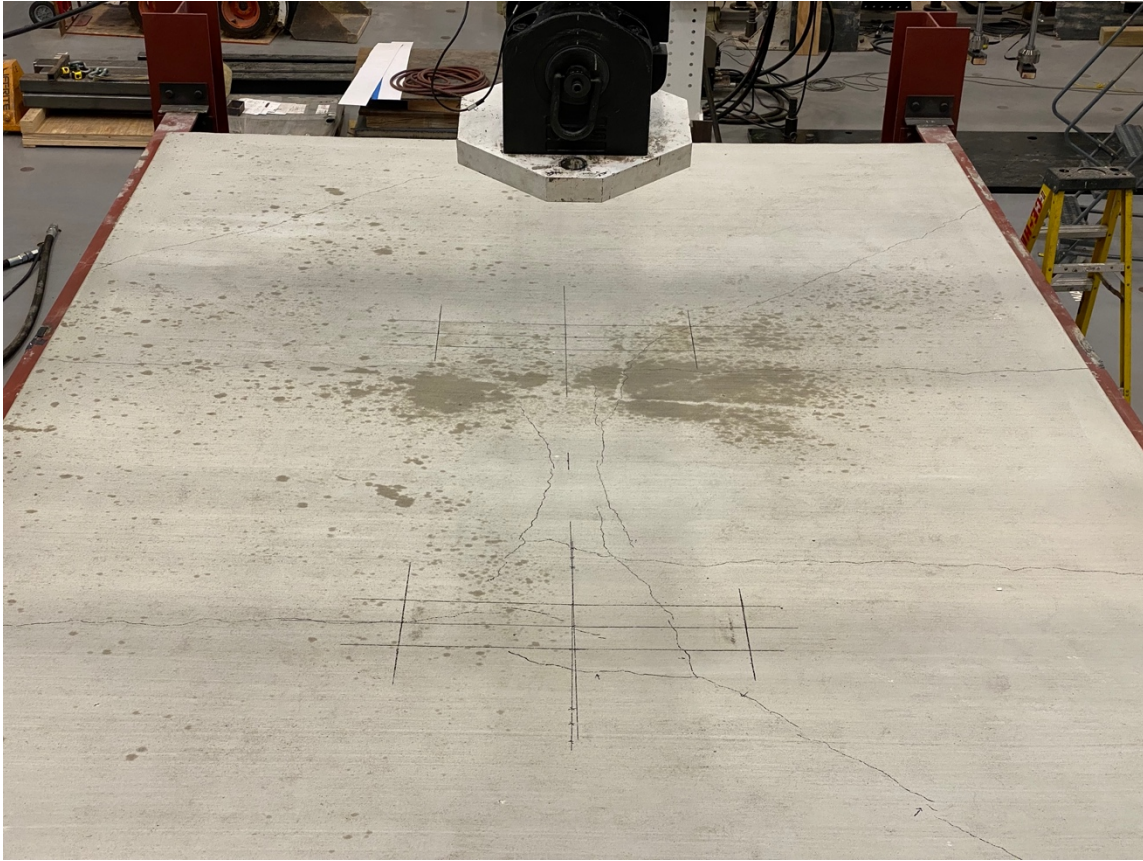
Concrete deck separation from steel beam (Photo by Matthew Yarnold)
